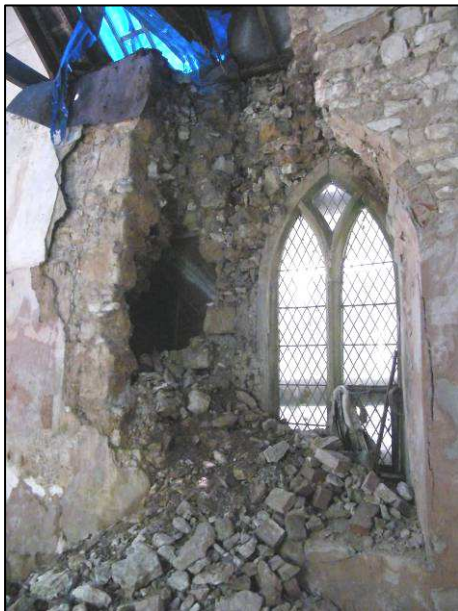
(shot 30): Collapsed rubble core within the south elevation, looking north-northwest
